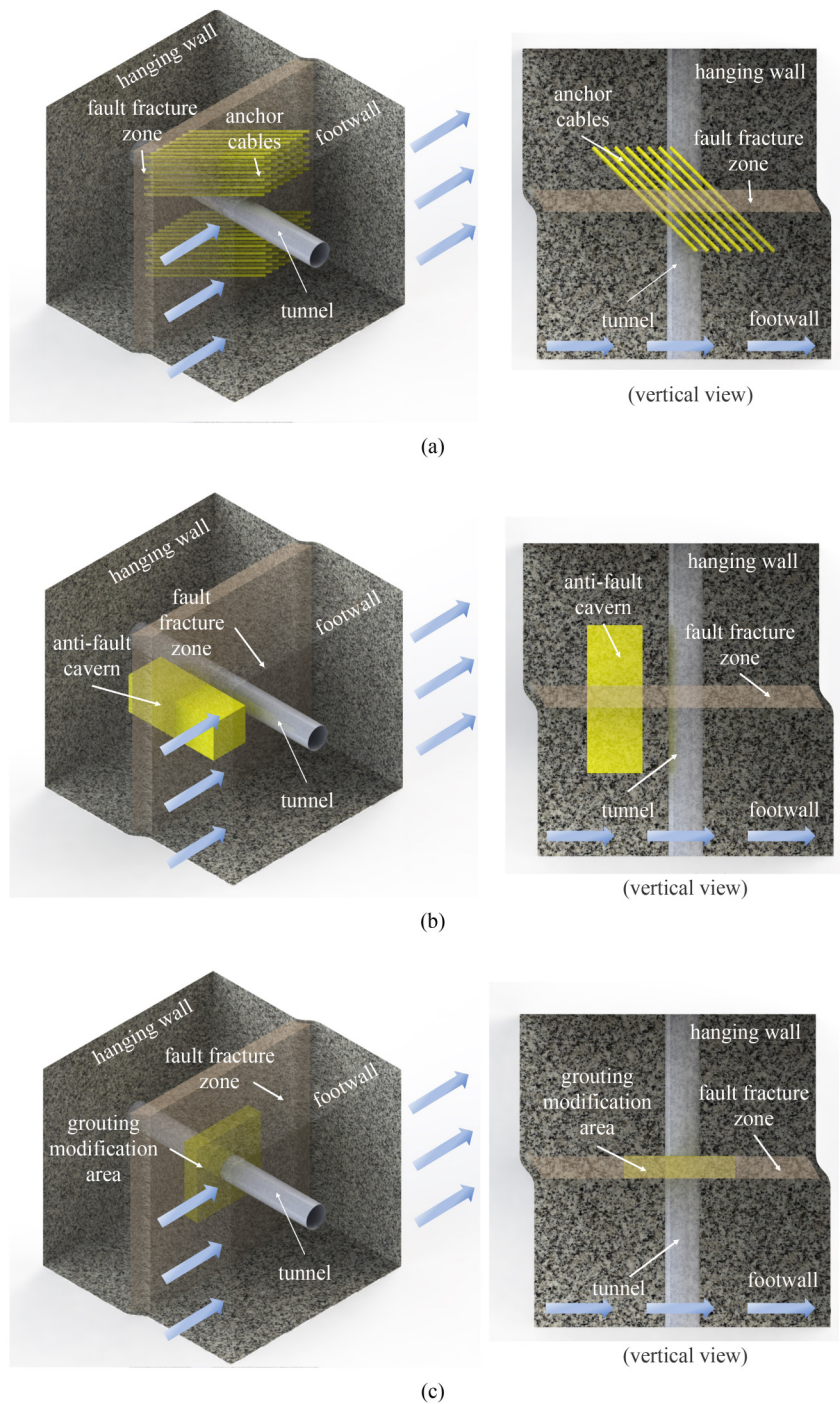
LRAF for tunnels crossing active faults: (a) anchor cables; (b) anti-fault caverns; (c) local rock mass grouting modification.
